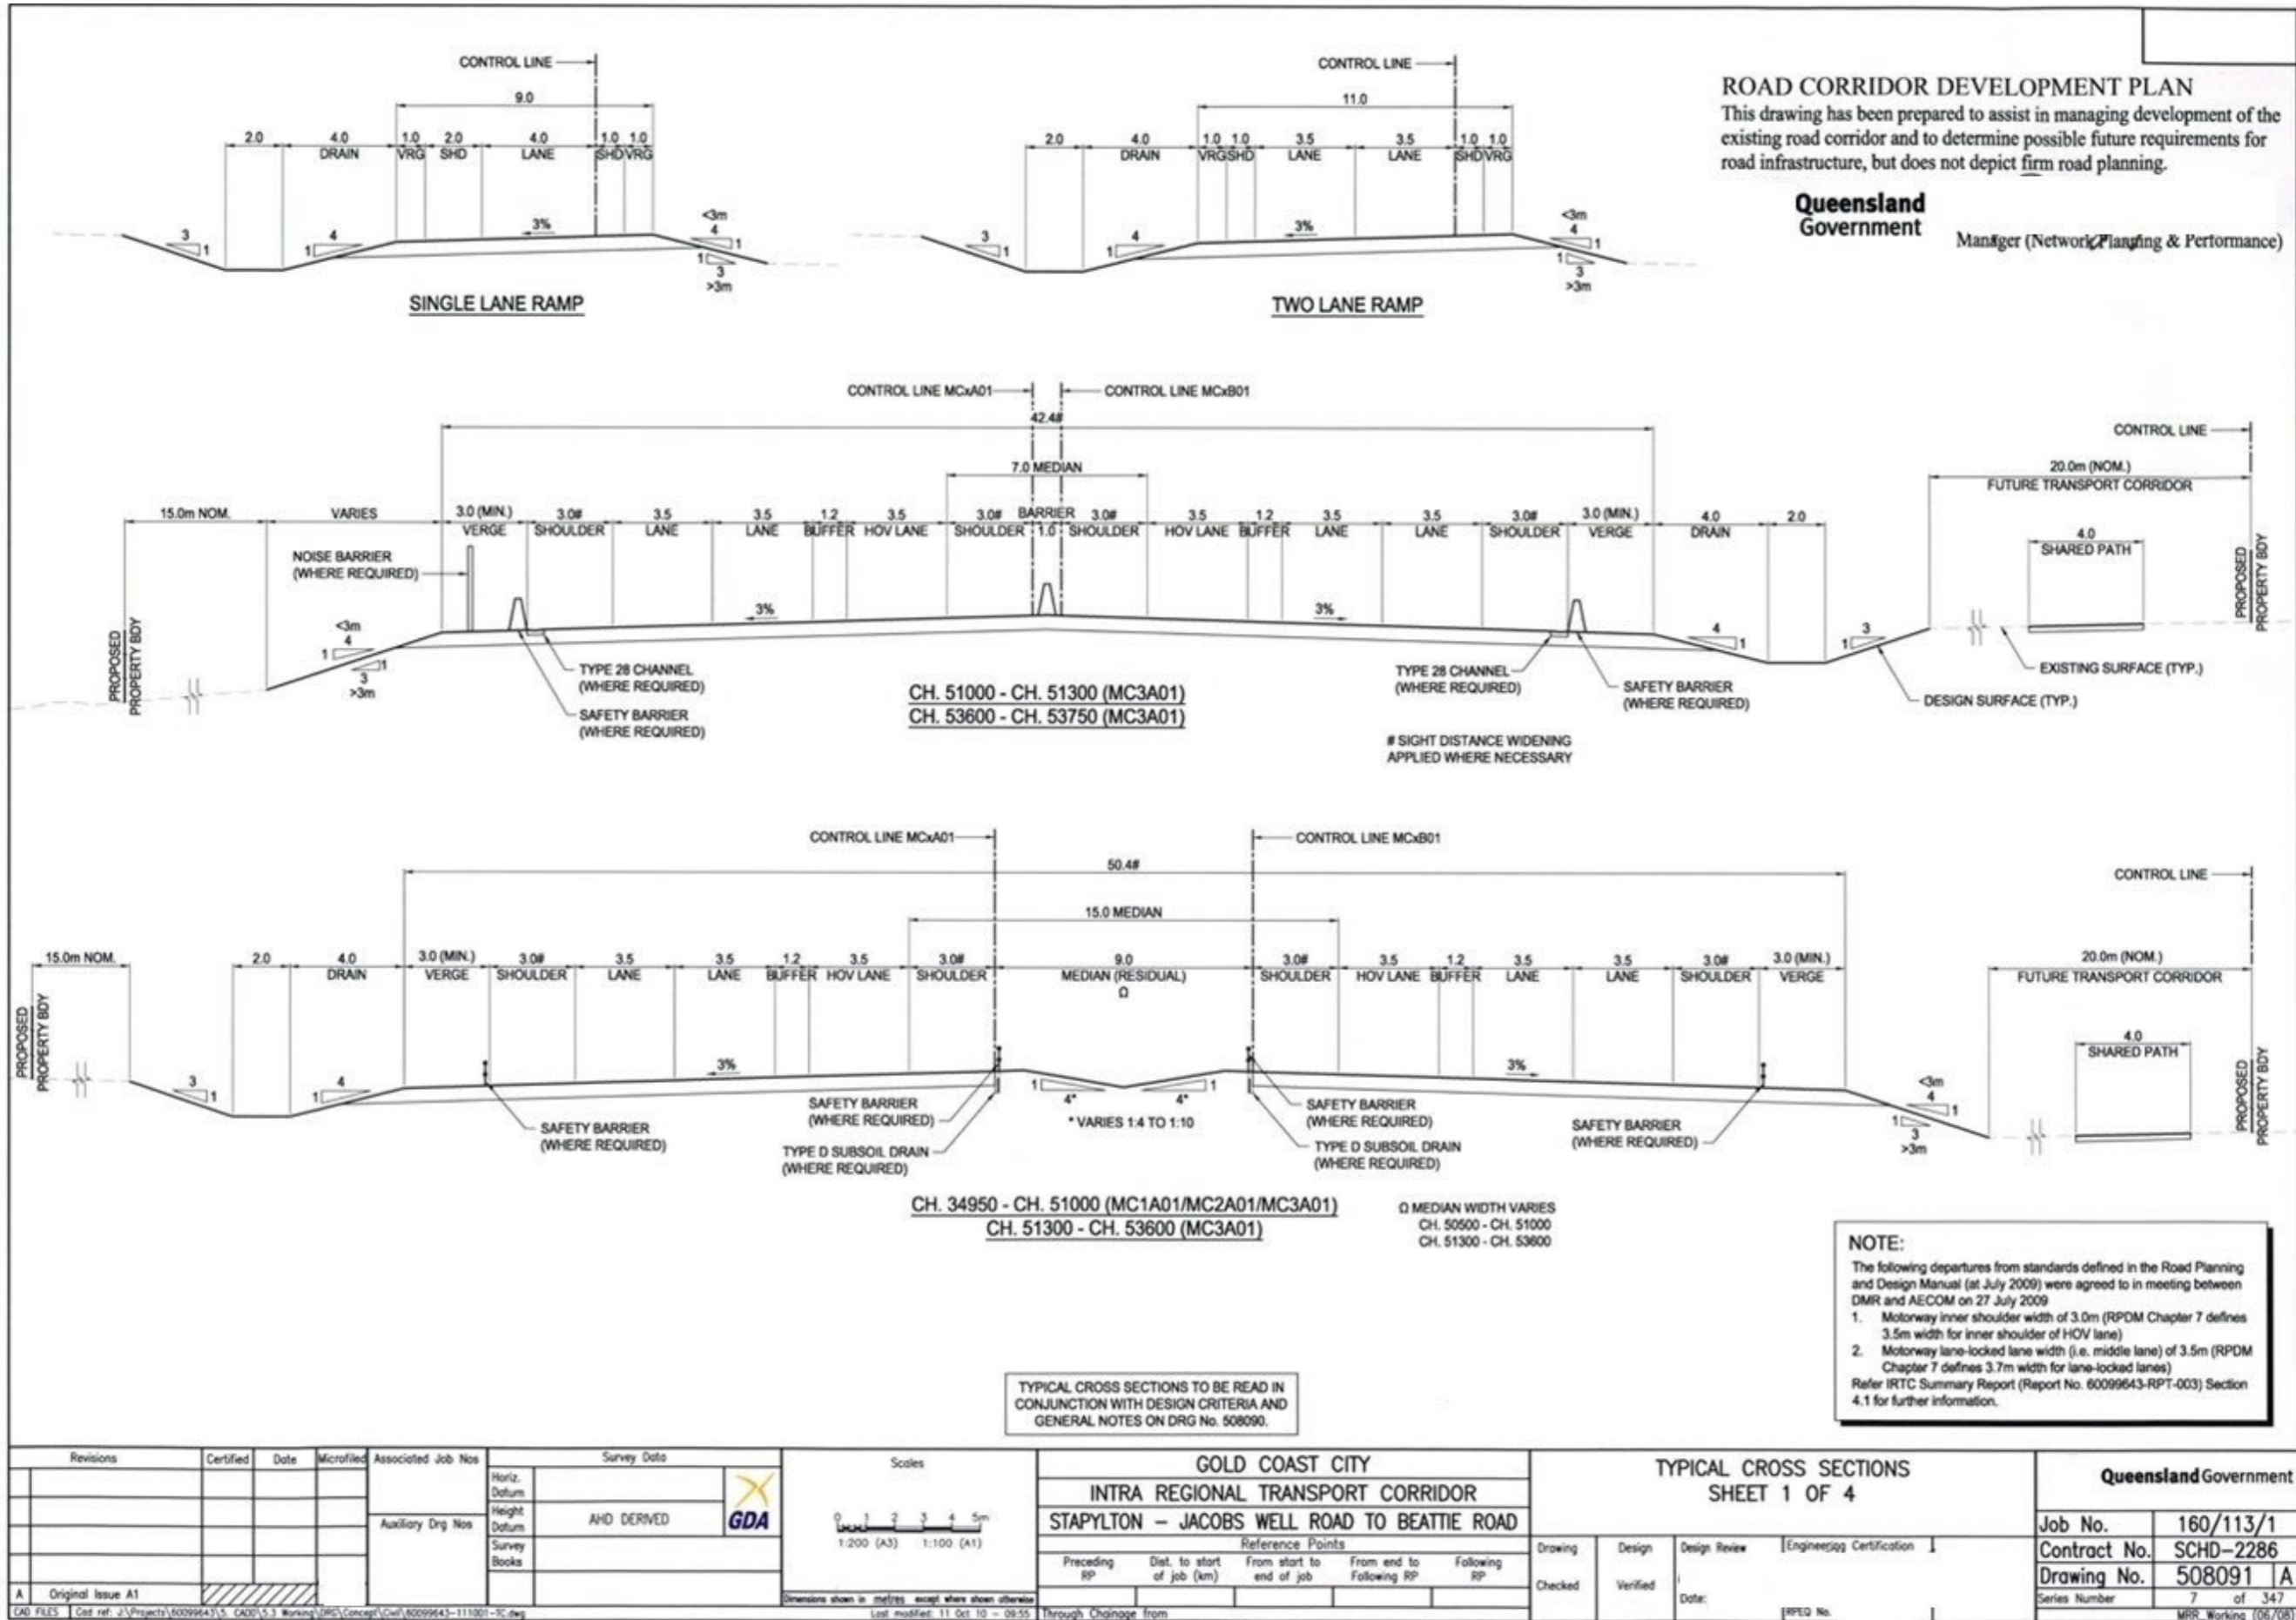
(b) – Type / Typical cross sections and details – registered example
